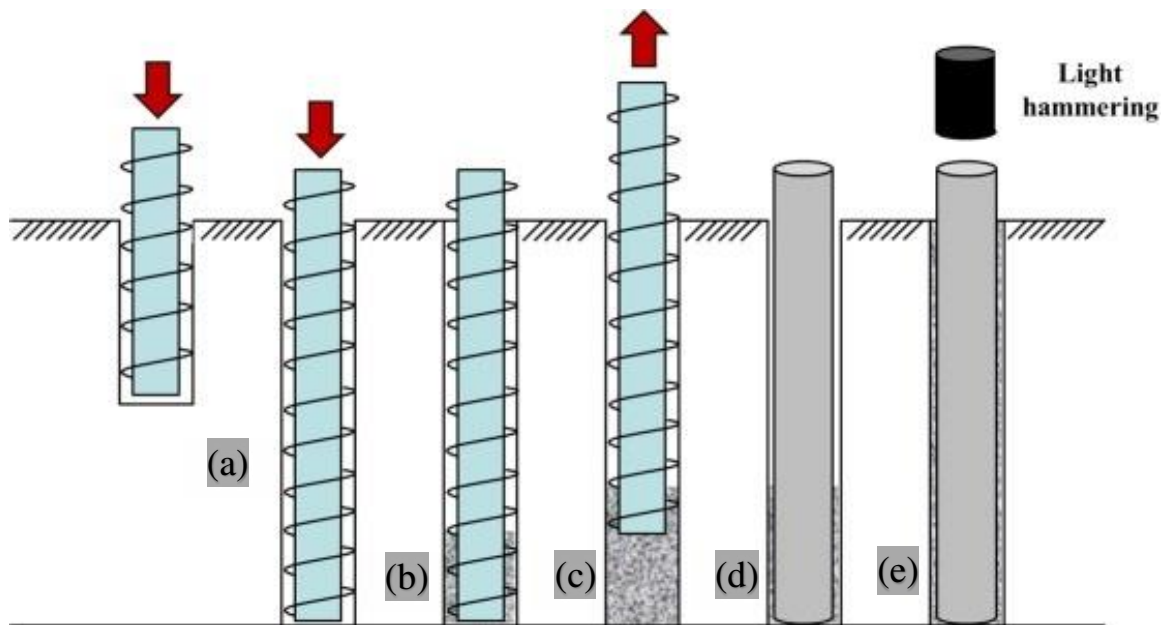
Installation of Bored Piles step by step, (a) boring, (b) 1st cement grout injection, (c) auger retraction, (d) pile installation, and (e) 2nd cement grout injection [3]
